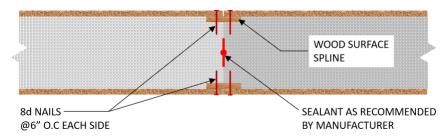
Wall-Wall (Surface Spline) Connection (adapted from SIPA [2022])
